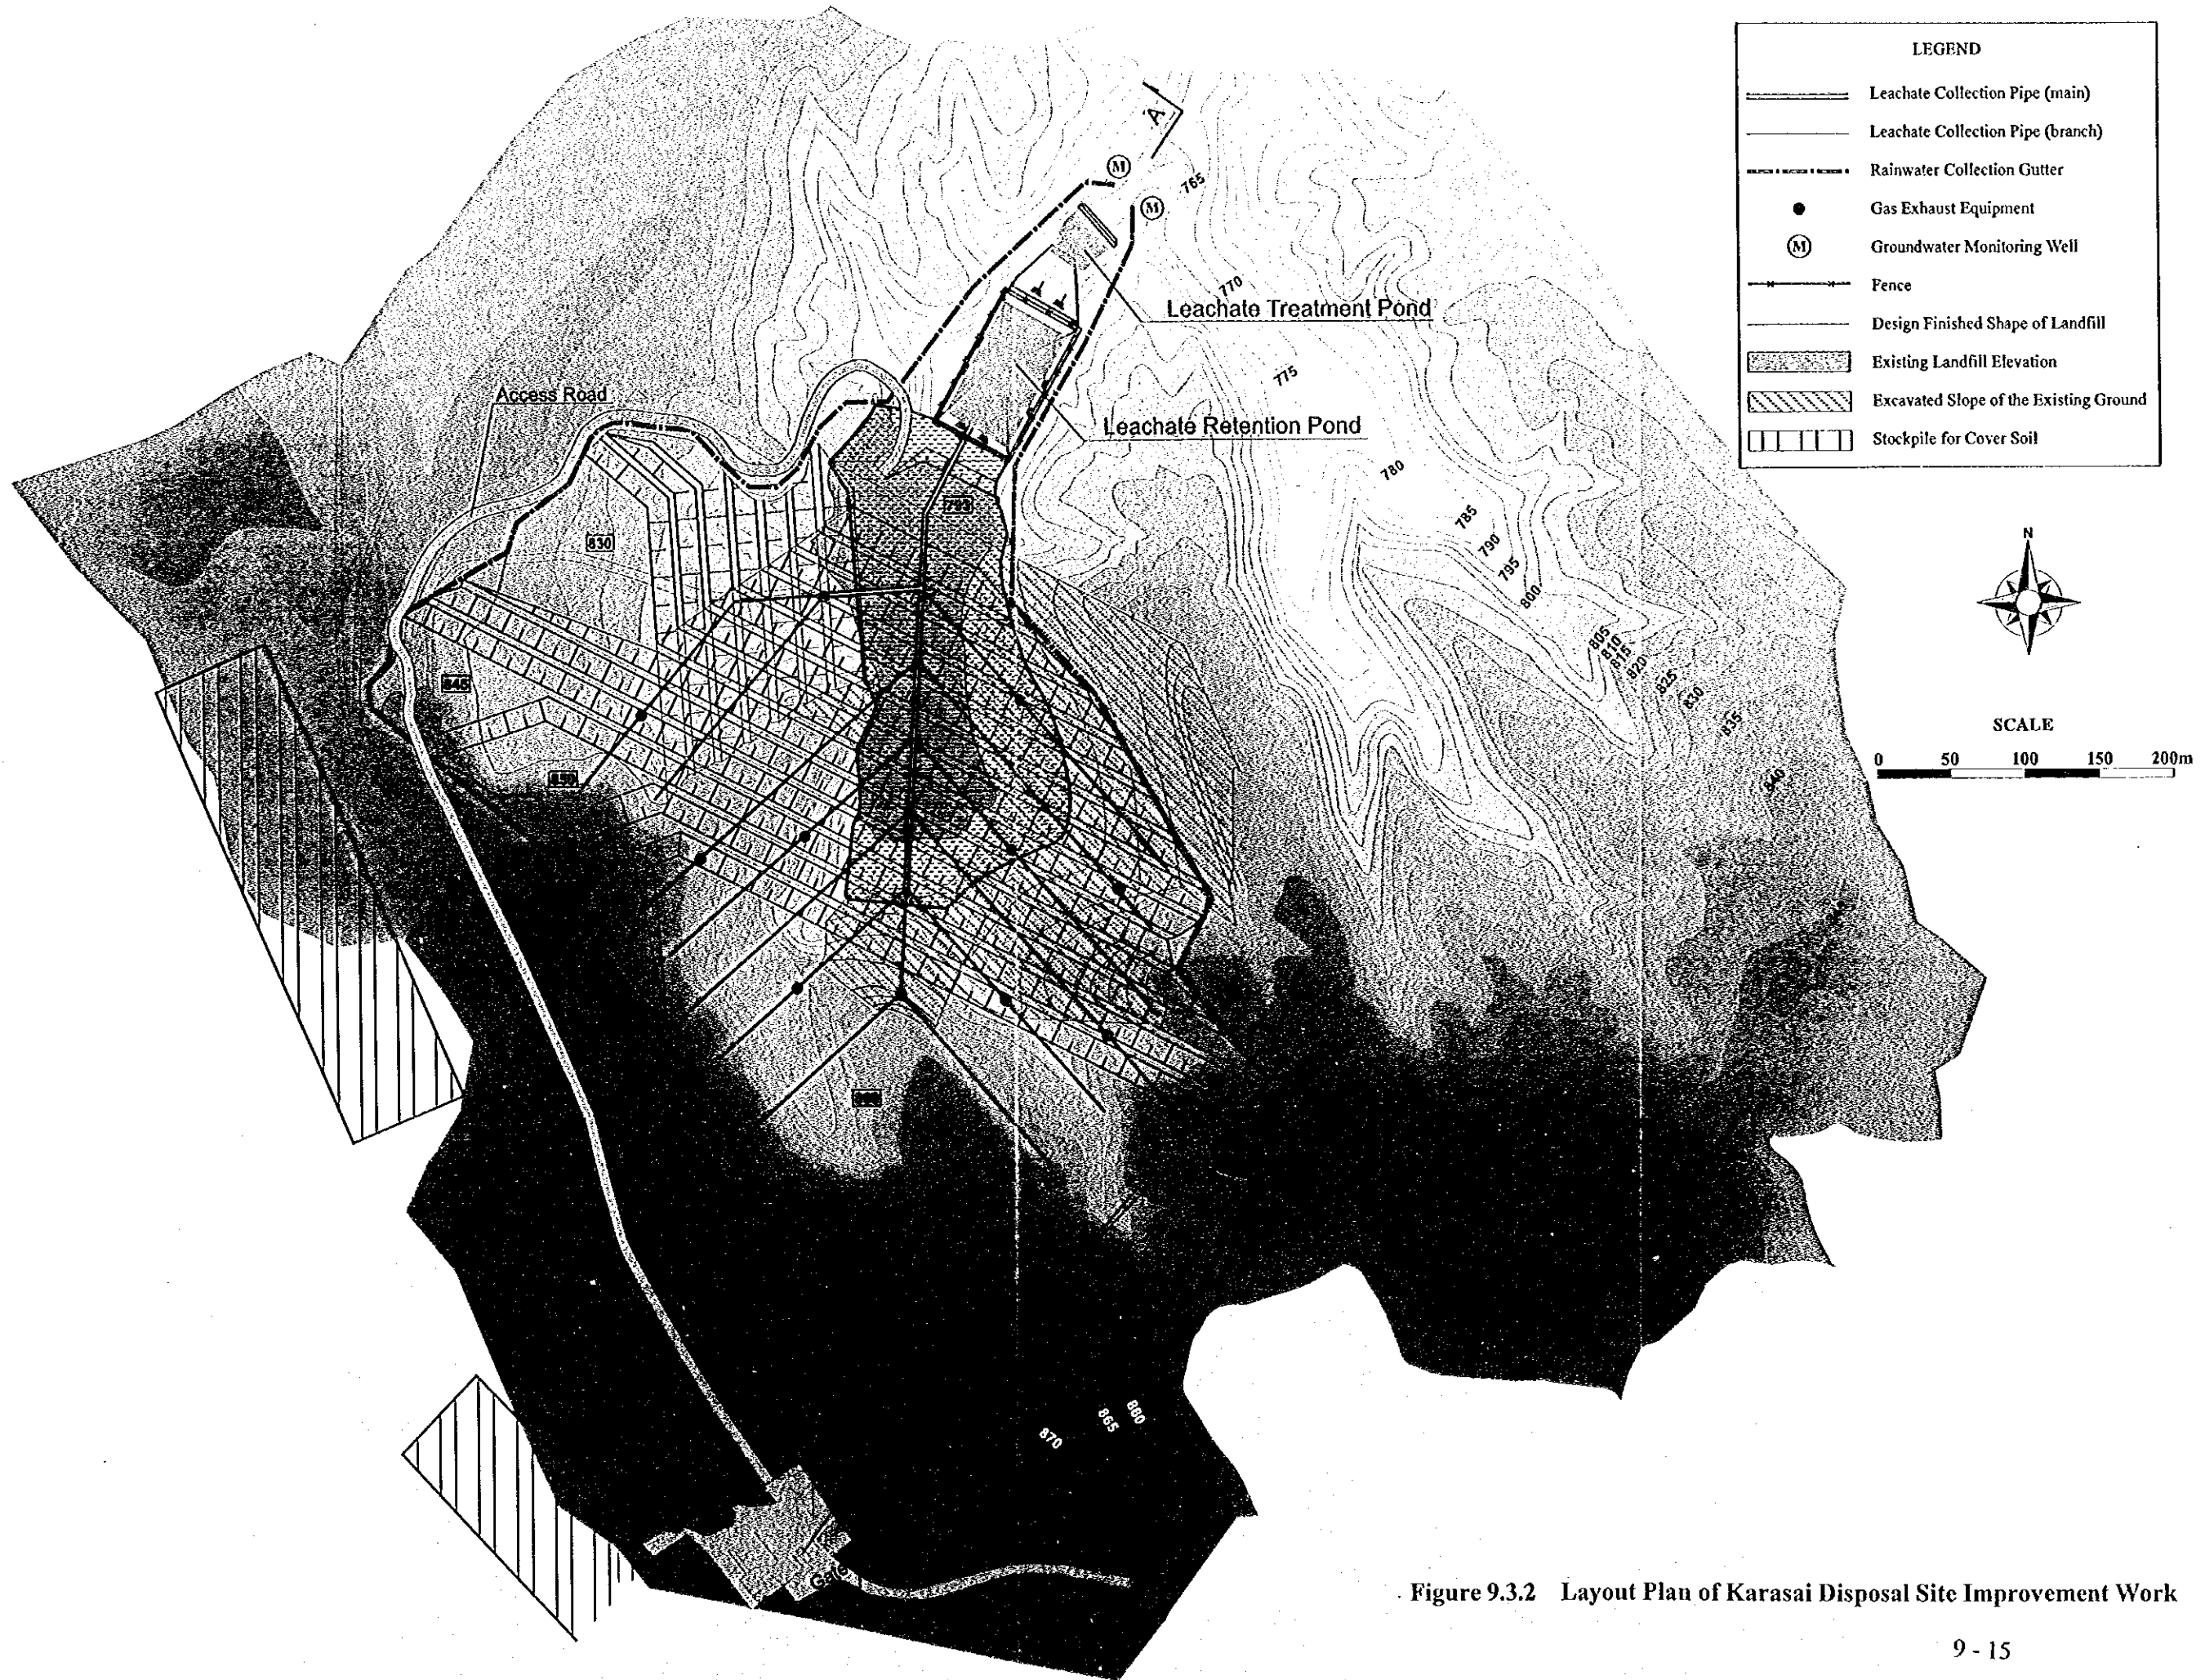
Layout Plan of Karasai Disposal Site Improvement Work
